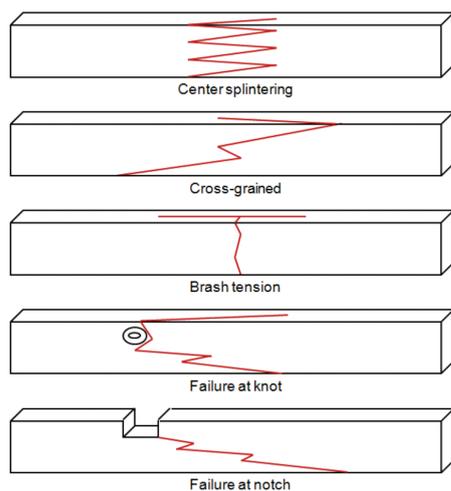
Facies of timber scaffold board failure (bottom view)
